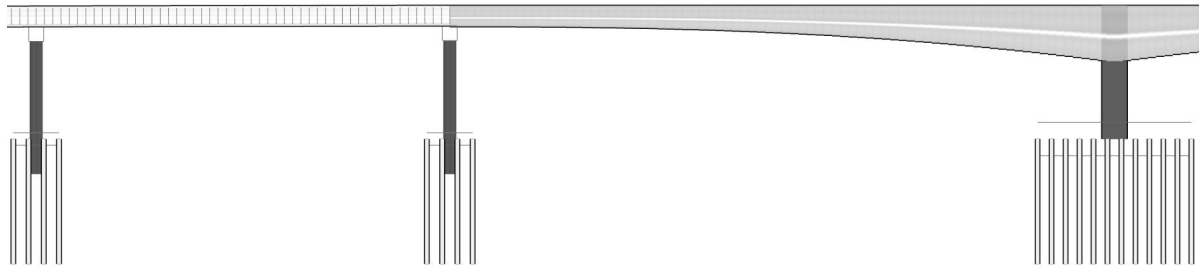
Front view of the foundation with pile centre-to-centre distance.
